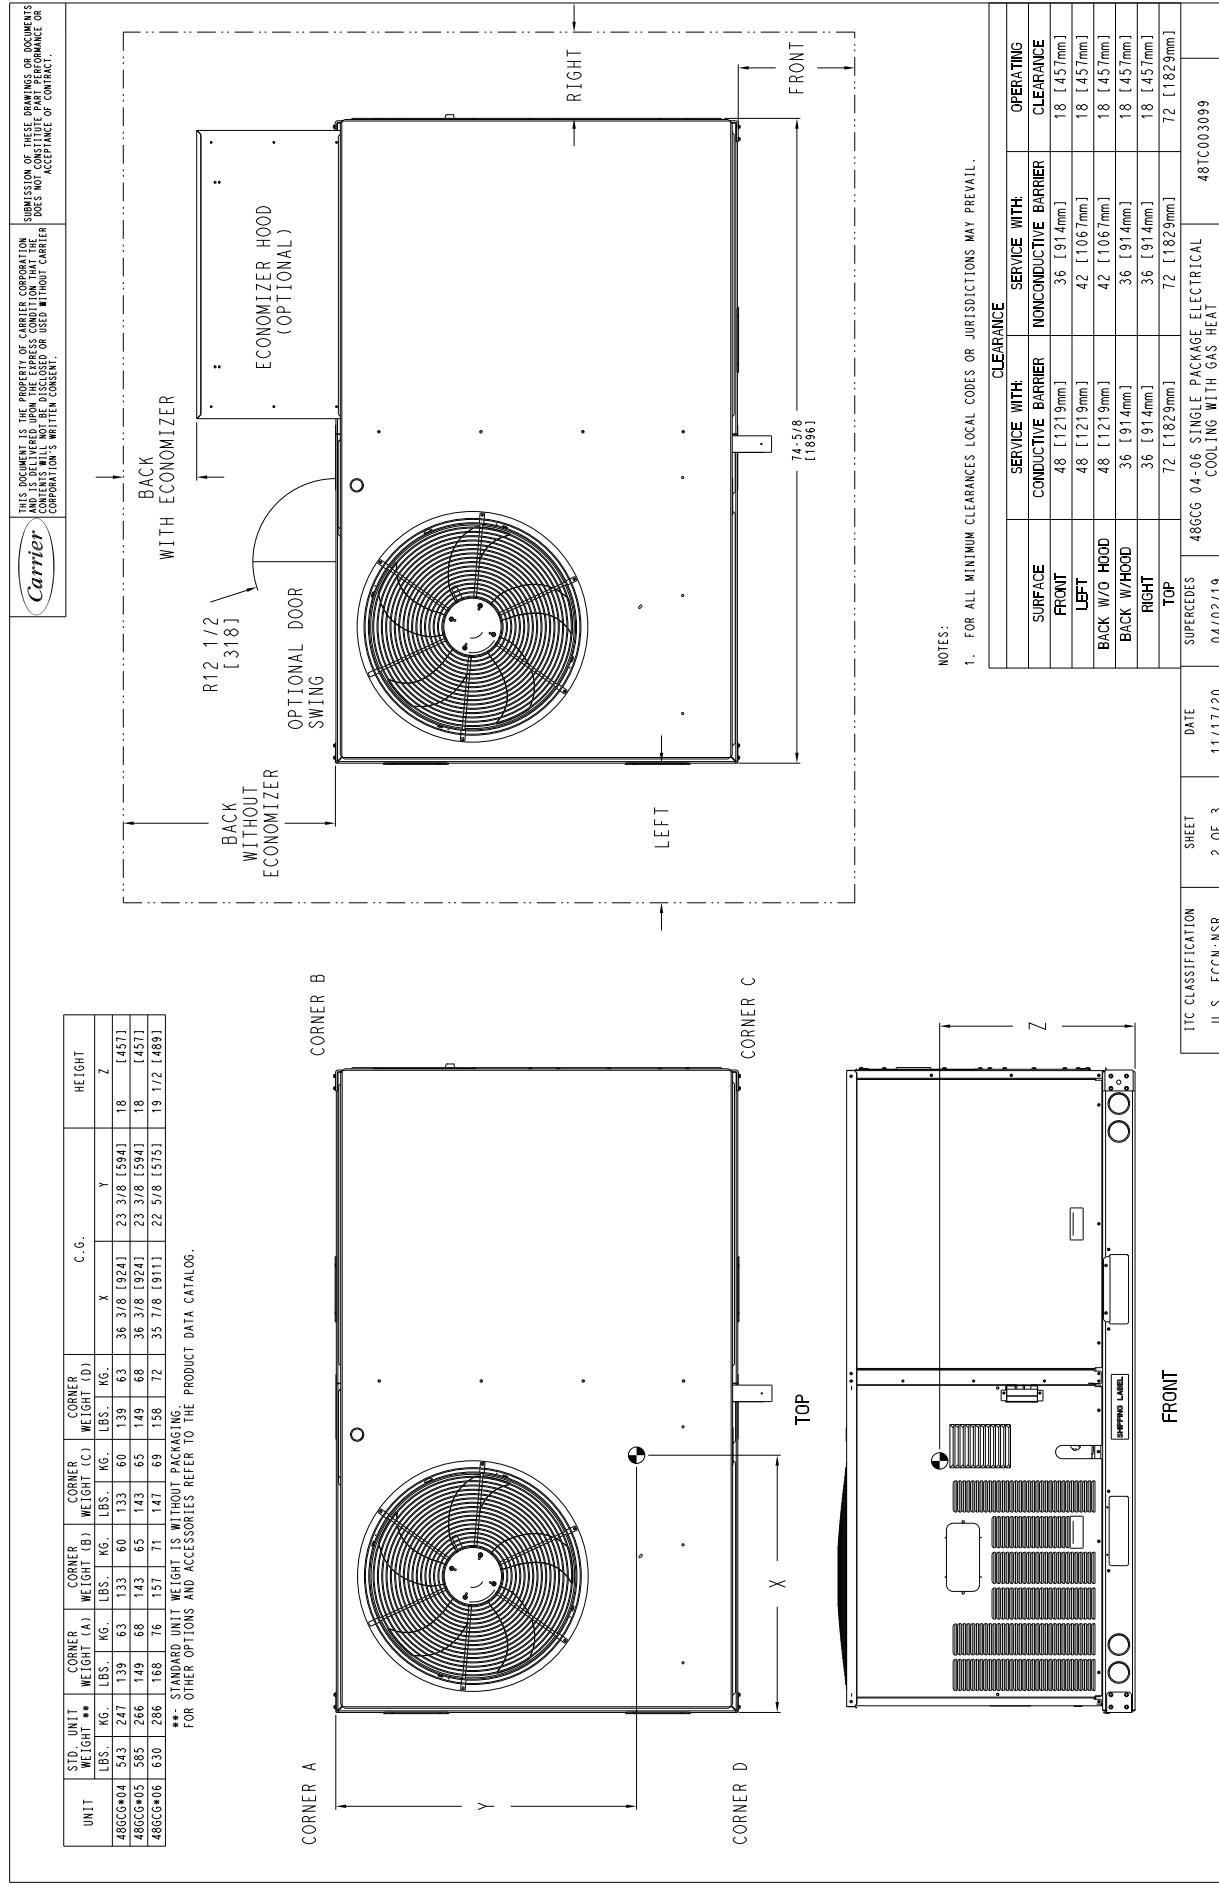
48GCG*04-06 Unit Dimensions (cont)
